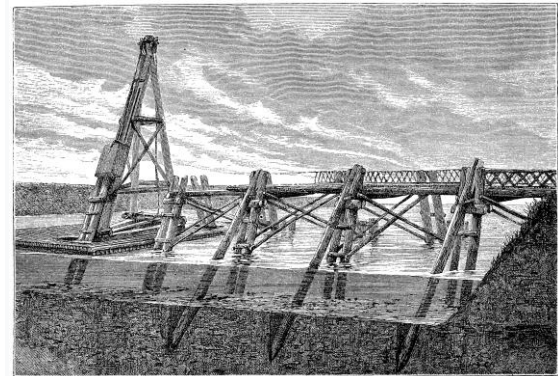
Artists impression of Caesar's Rhine Bridge. construction with floating pile driving rigs, 55 B.C.
